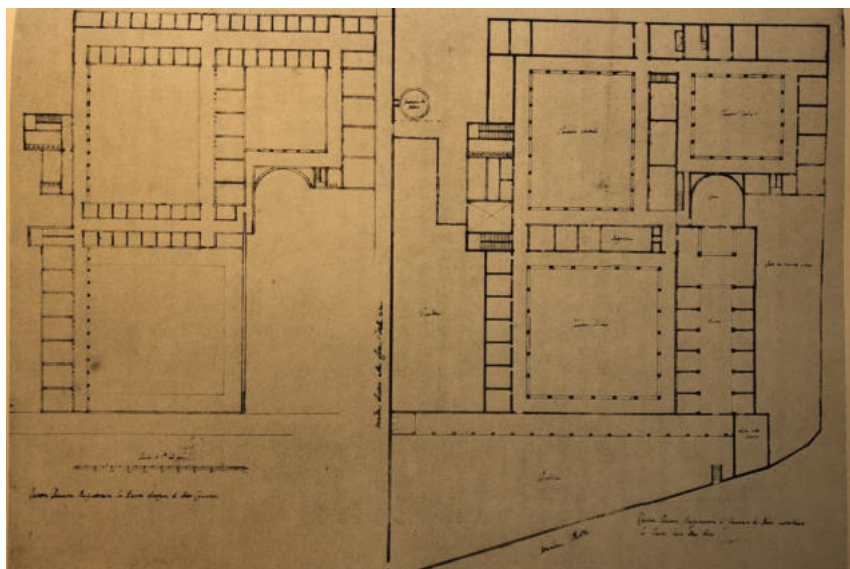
Annunziata floor plan. The upper section shows the ground floor of the complex and the bottom section shows the first level.
